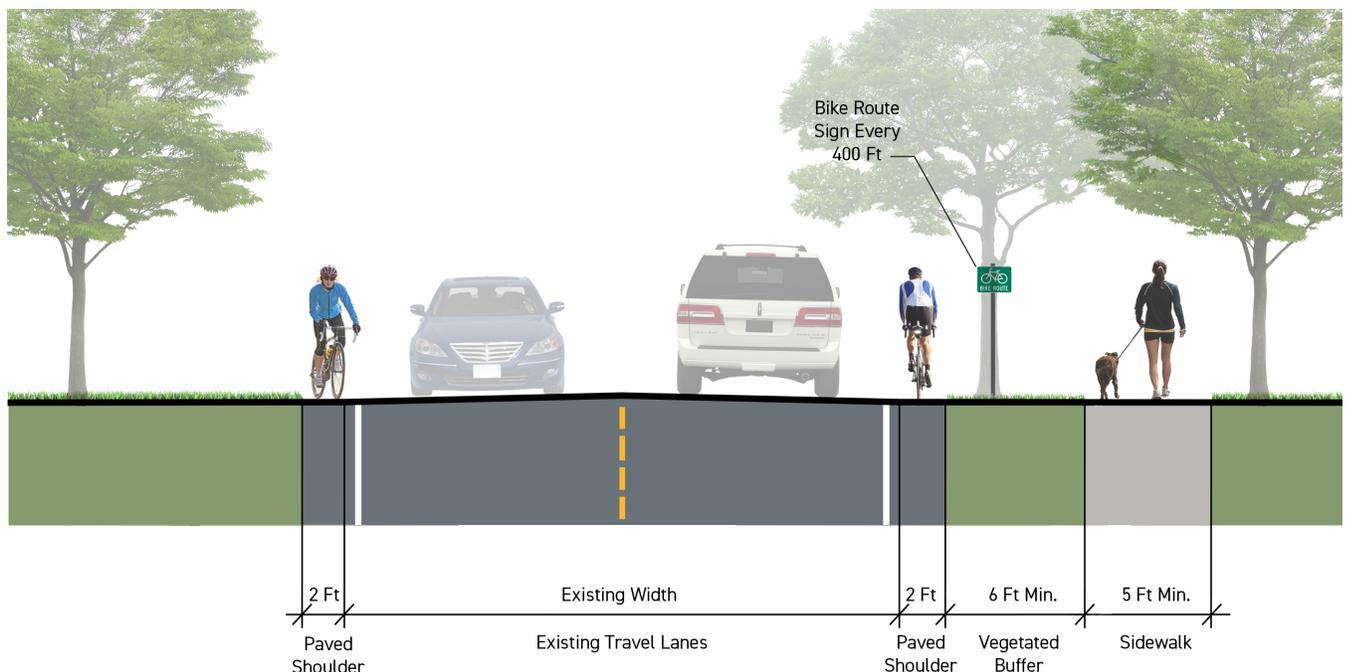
FIGURE N - ROADS WITH SHOULDERS, TYPICAL SECTION
